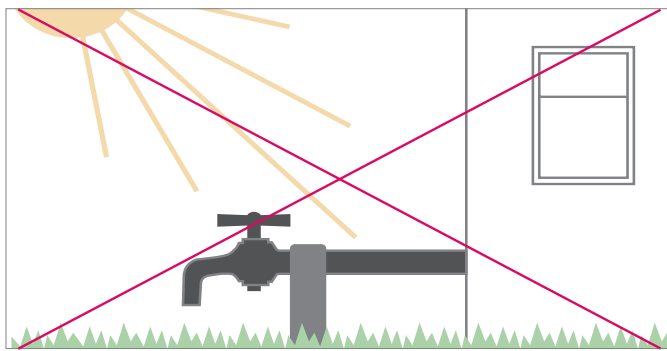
Unprotected installation in areas exposed to UV-radiation is not permitted, example: outdoors
